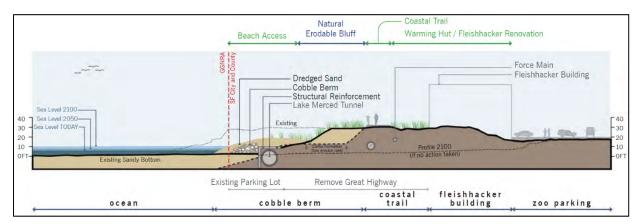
Summary of 2012 Master Plan Recommendations at Zoo Parking Lot
